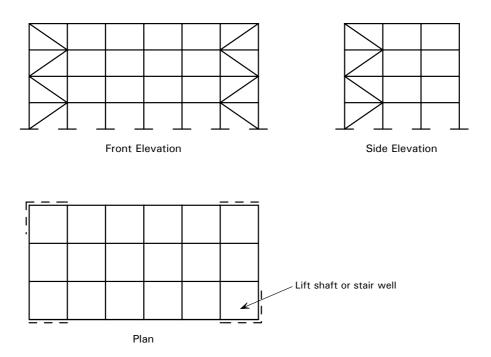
'Simple structure' with nominally pinned connections and bracing
